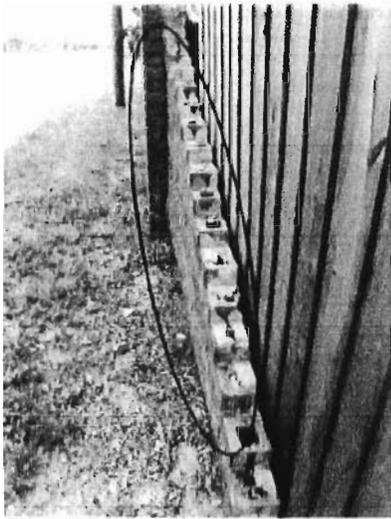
Photograph shows lack of vertical reinforcing steel in failed wall section. wall.
